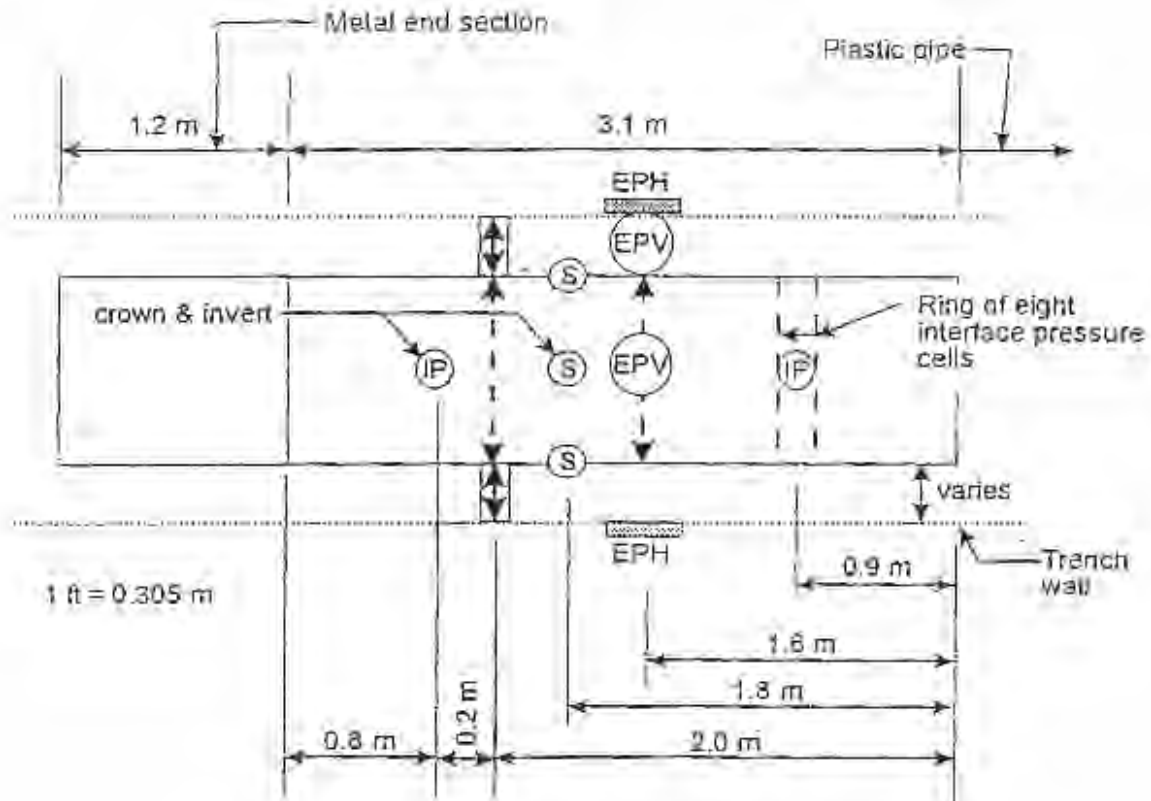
Cross-Section of Metal Pipe in Trench with Instrumentation
